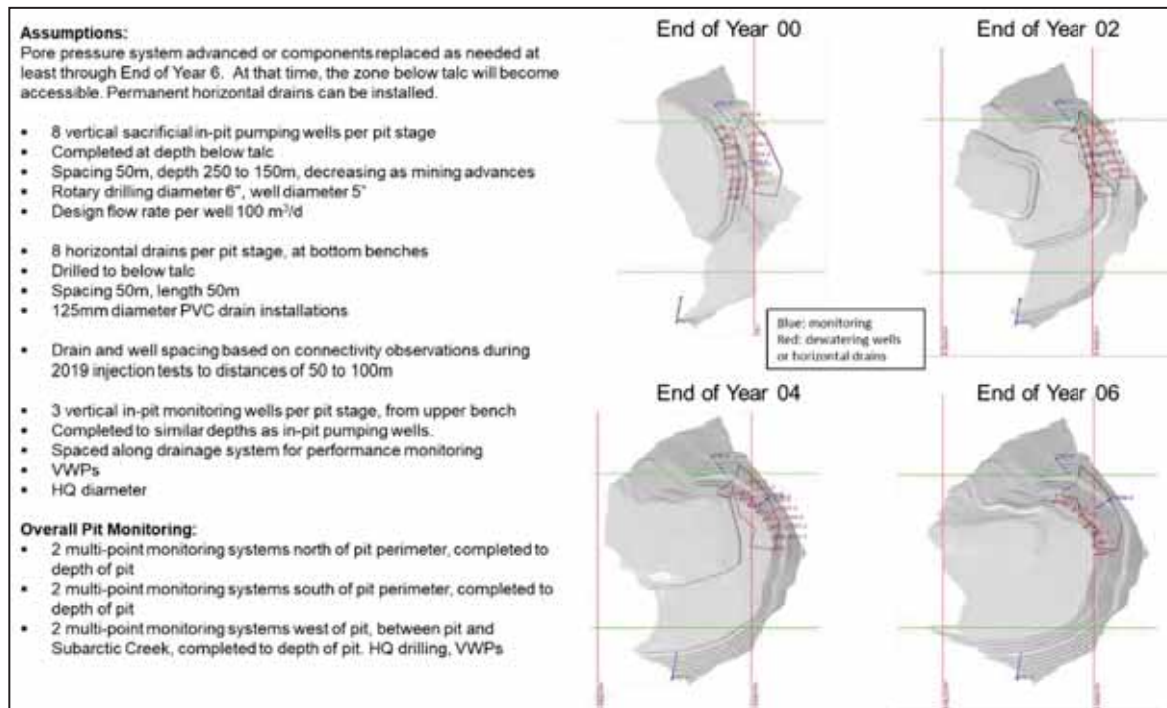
Pore Pressure Management Assumptions for East and Northeast Pit Walls (SRK 2020)
